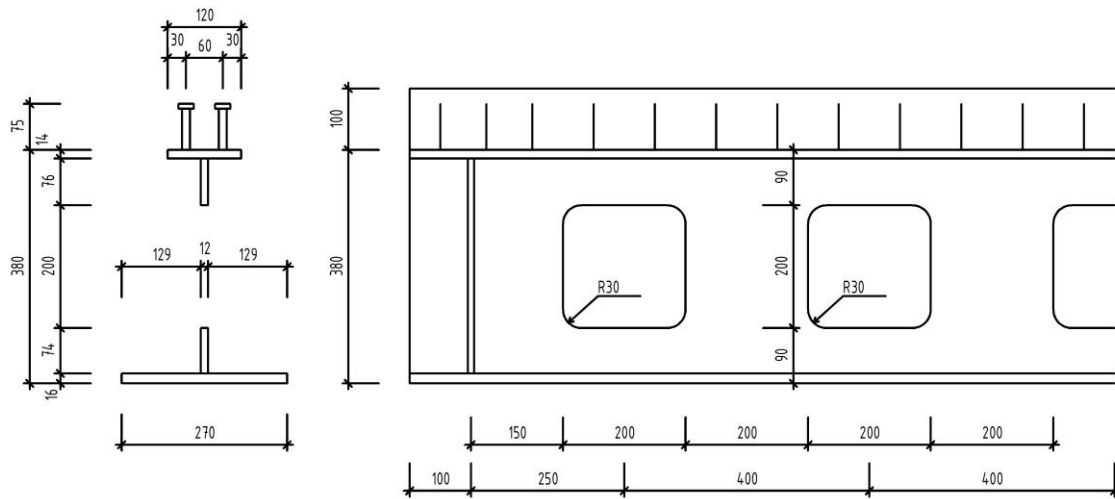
Cross-sectional dimensions and web opening positioning.
